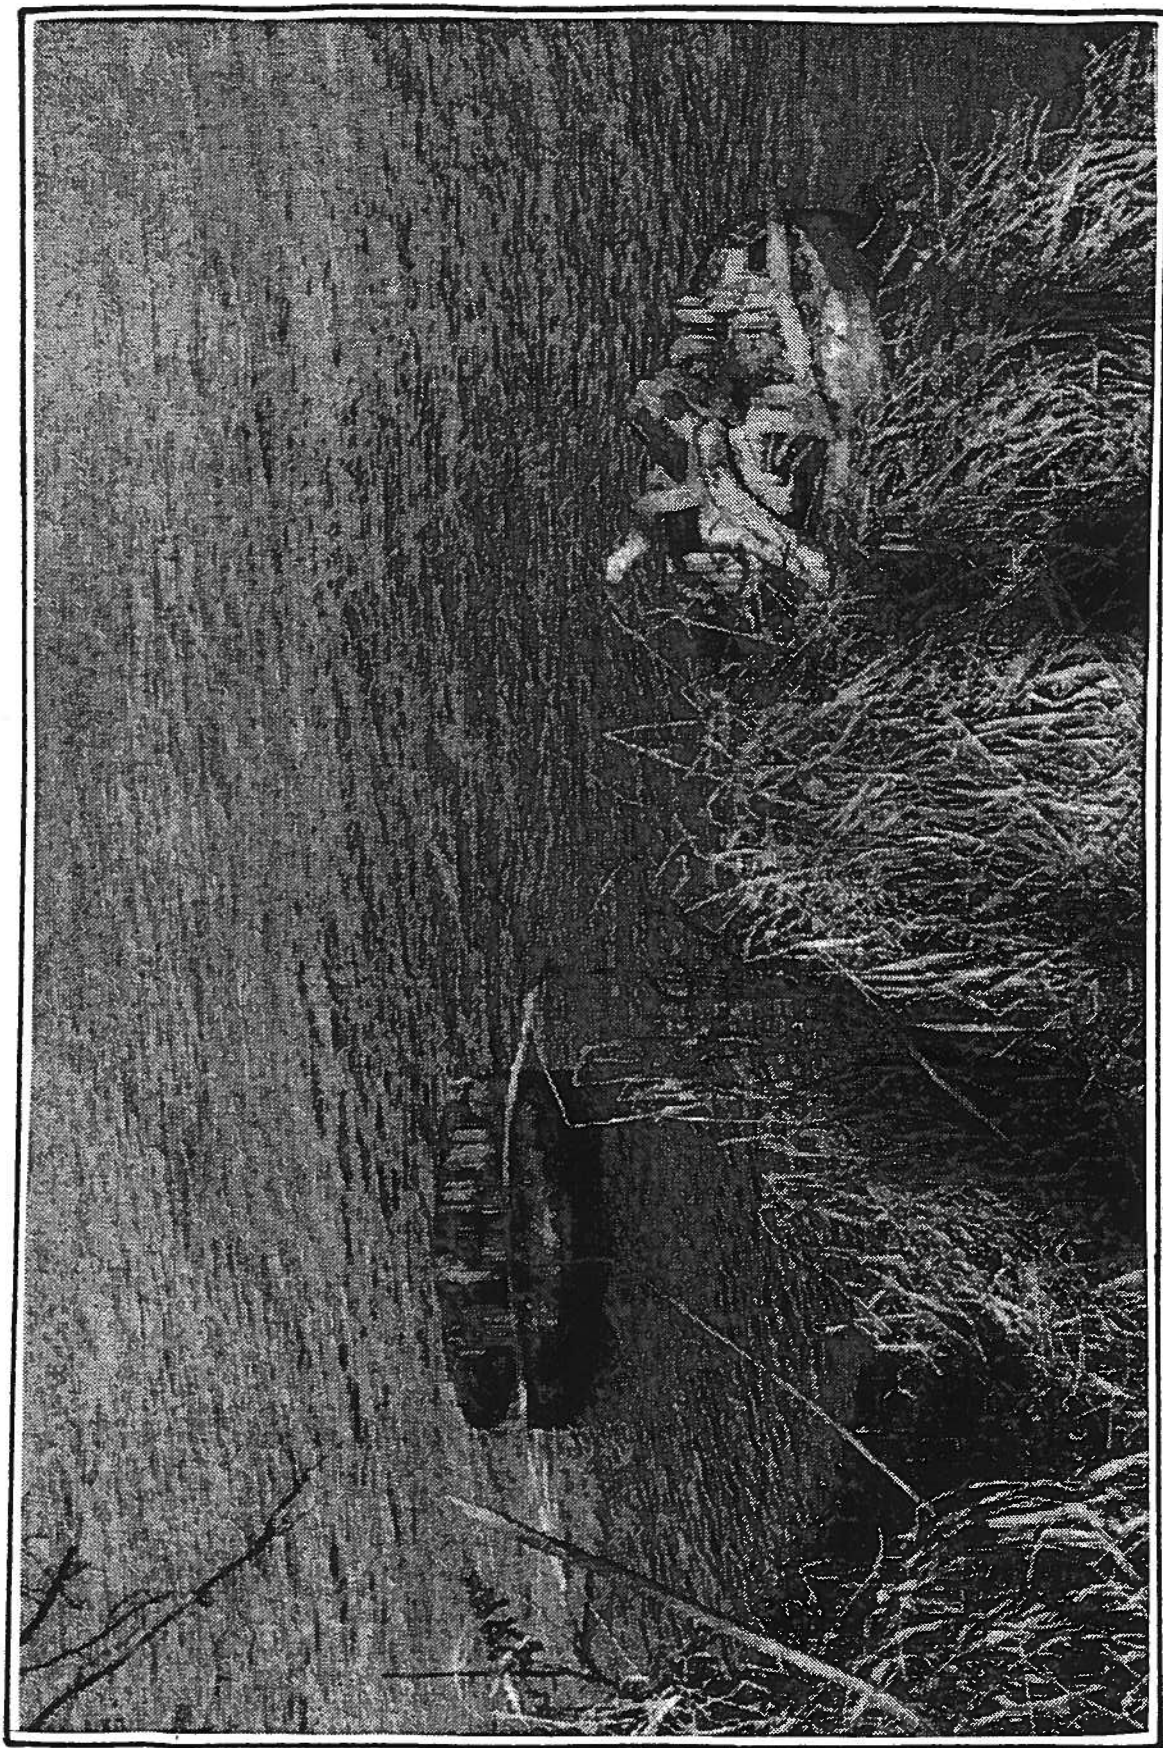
Photograph of extant North Bridge footings observable near 32 CS 4671. View is from the southeast towards the northwest. Photograph by author.
